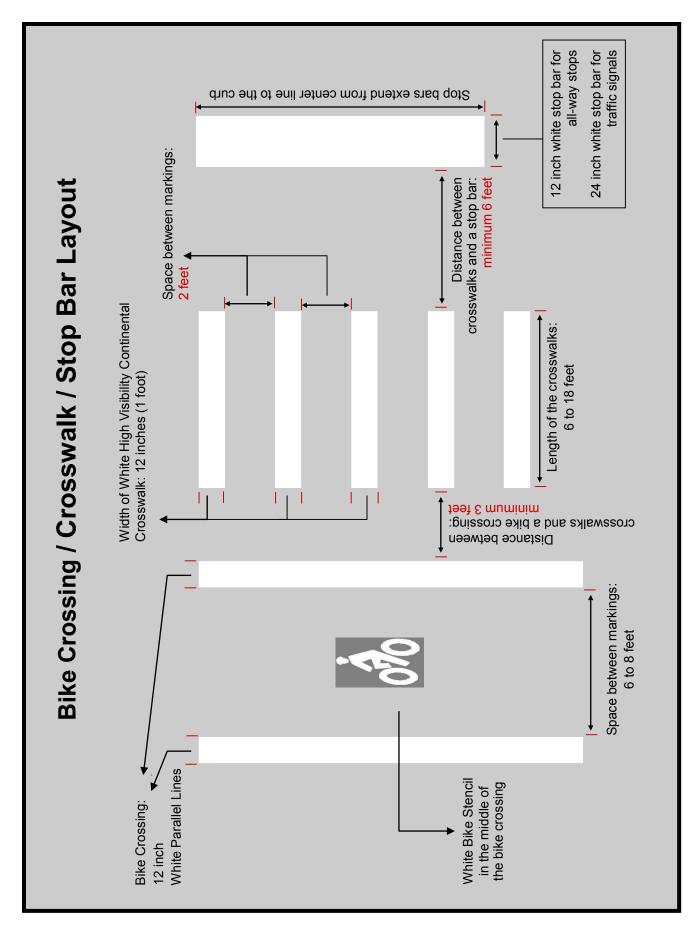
Bike Crossing, Crosswalk, and Stop Bar Layout
